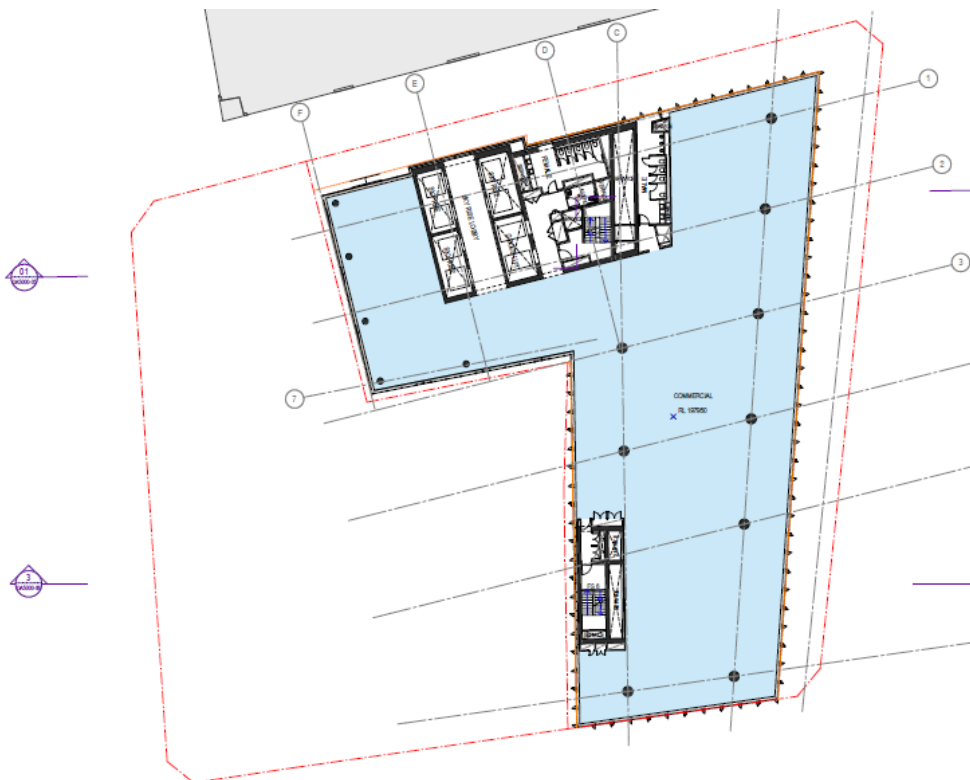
Proposed Levels 42-53 - typical sky-rise commercial office floor plate
